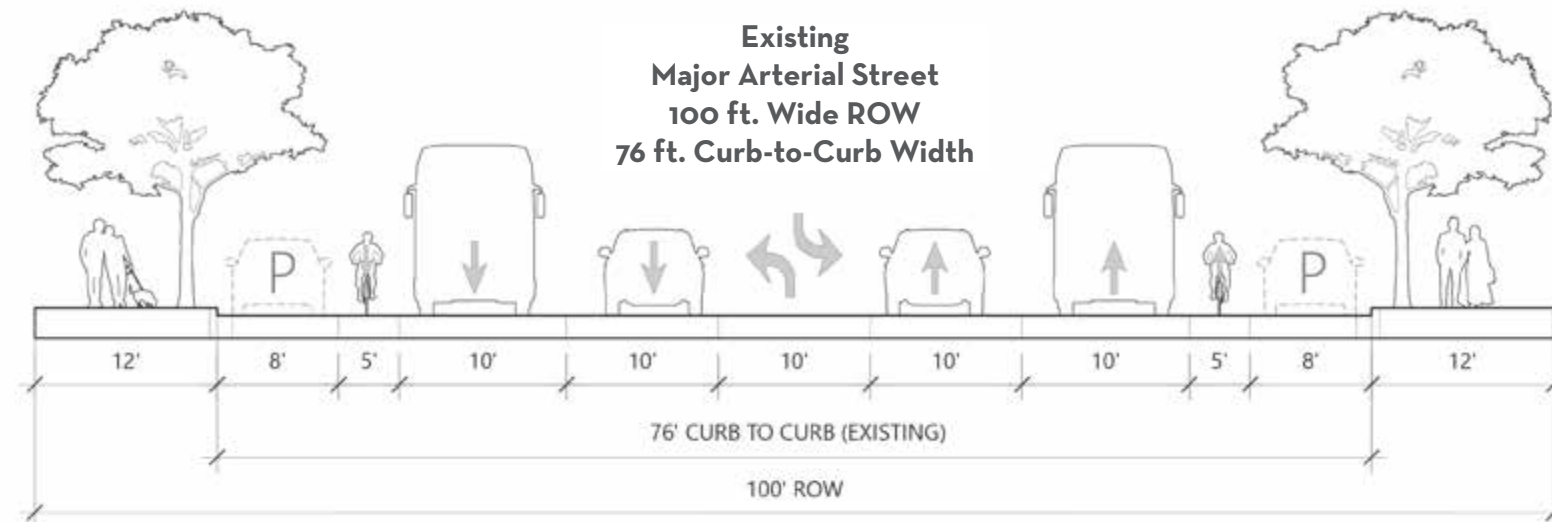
Existing: Typical Major Arterial Street with a 100 ft. wide ROW and 76 ft. wide curb-to-curb. See Chapter 8D-1 Roadway Reconfigurations for minimum travel lane widths.
